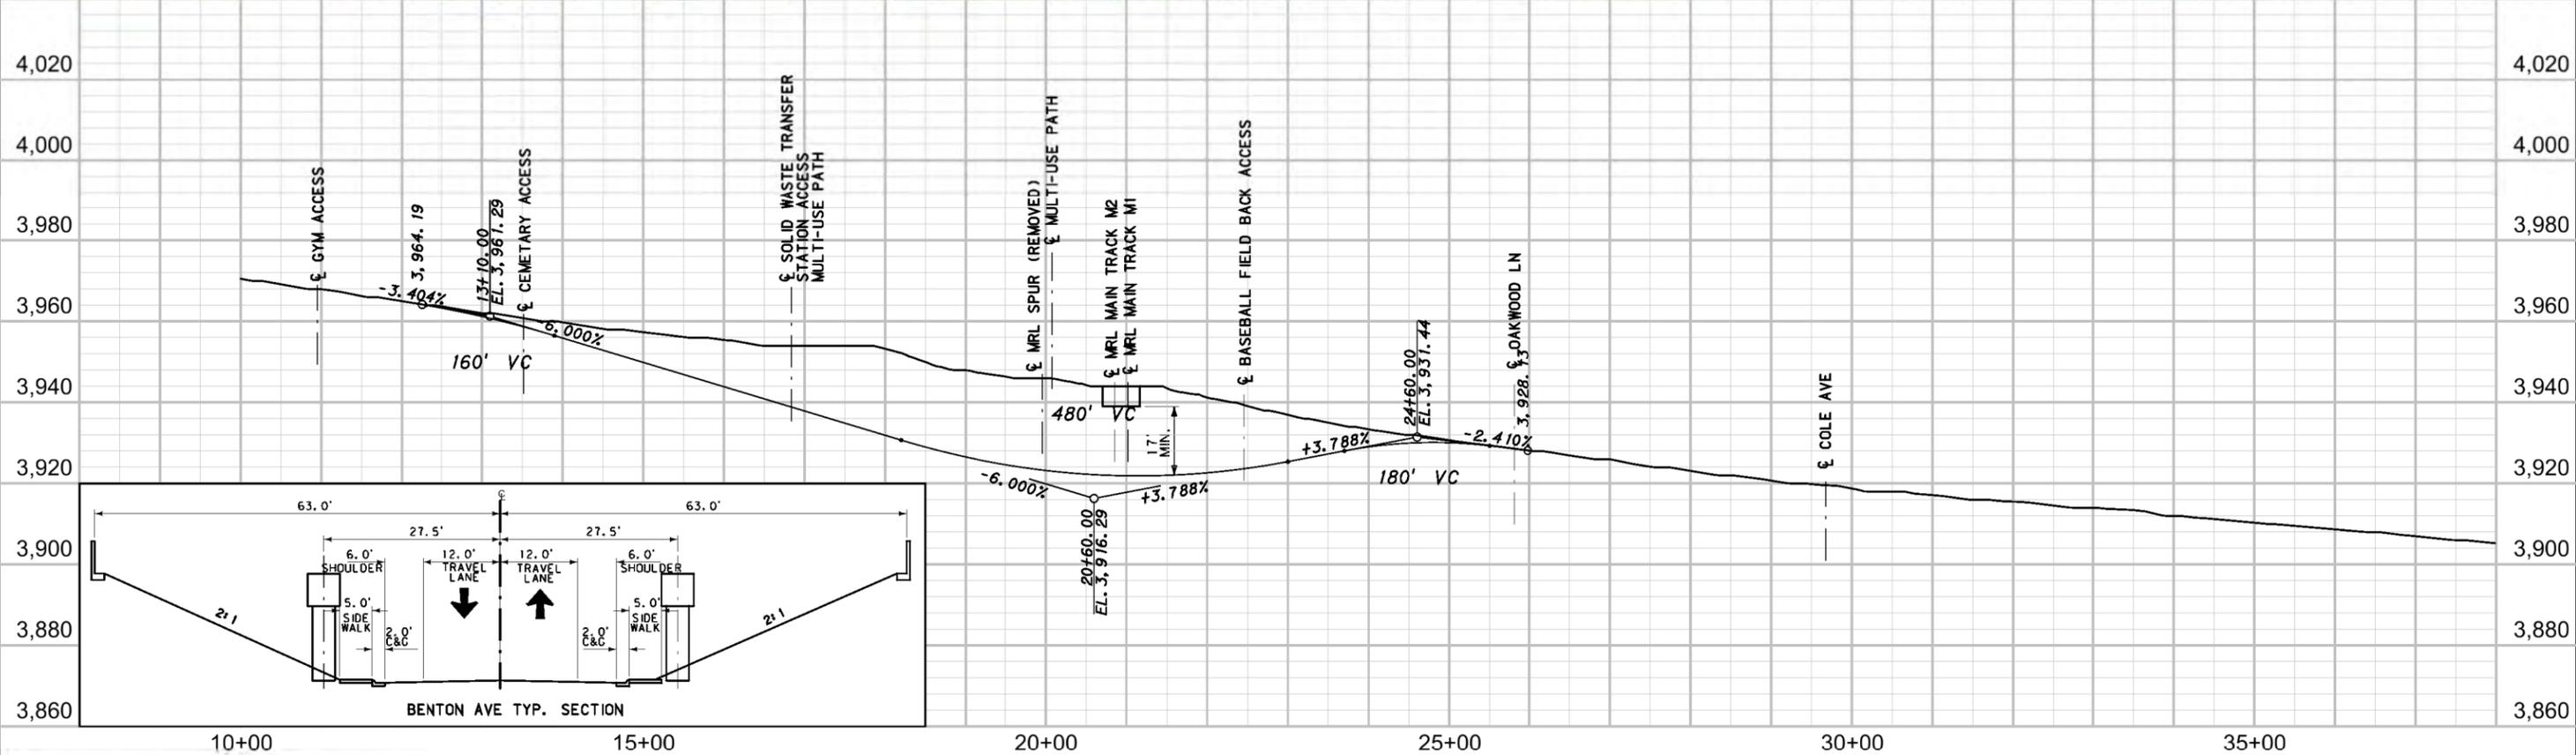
Benton Avenue Underpass Conceptual Plan and Profile
